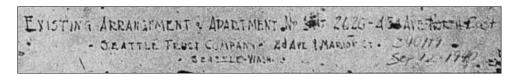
"Existing Arrangement of Apartment No. [illegible] 2020 43d Ave North East Seattle Trust Company ... [Building Permit] 340119, Sep 12 1940"
